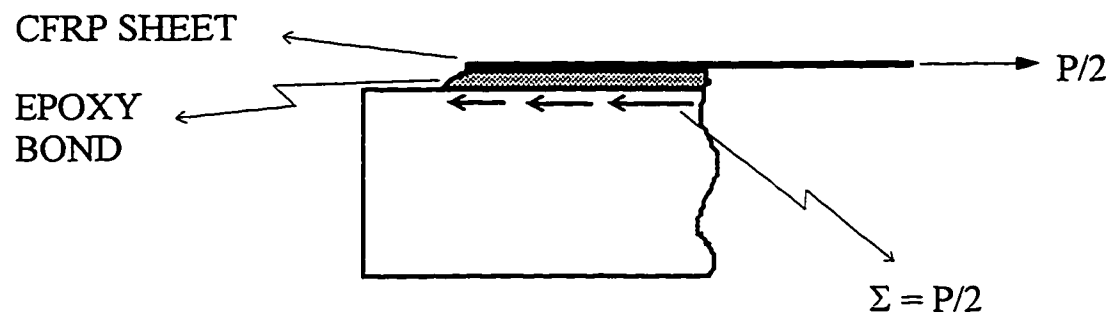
17 Shear Transfer between CFRP Sheet and Concrete
